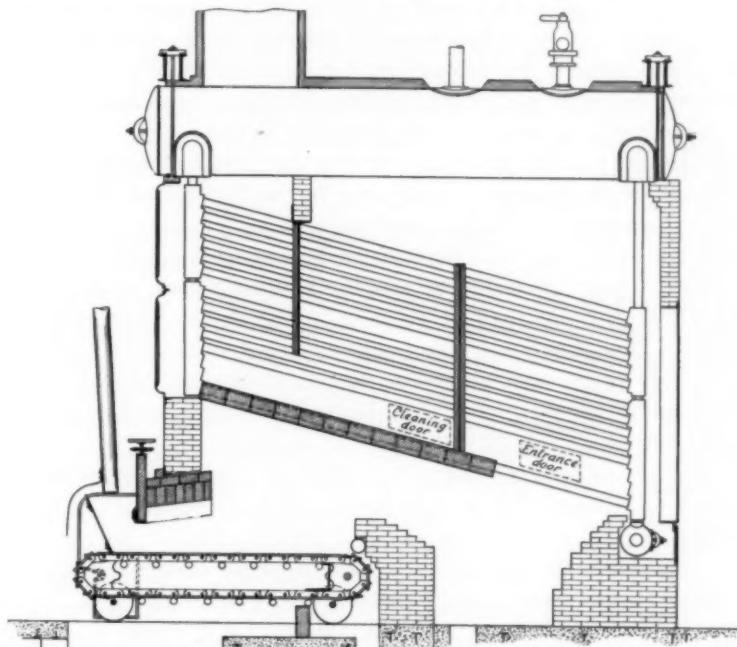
IMPROVED BOILER SETTING WITH SHORT IGNITION ARCH
